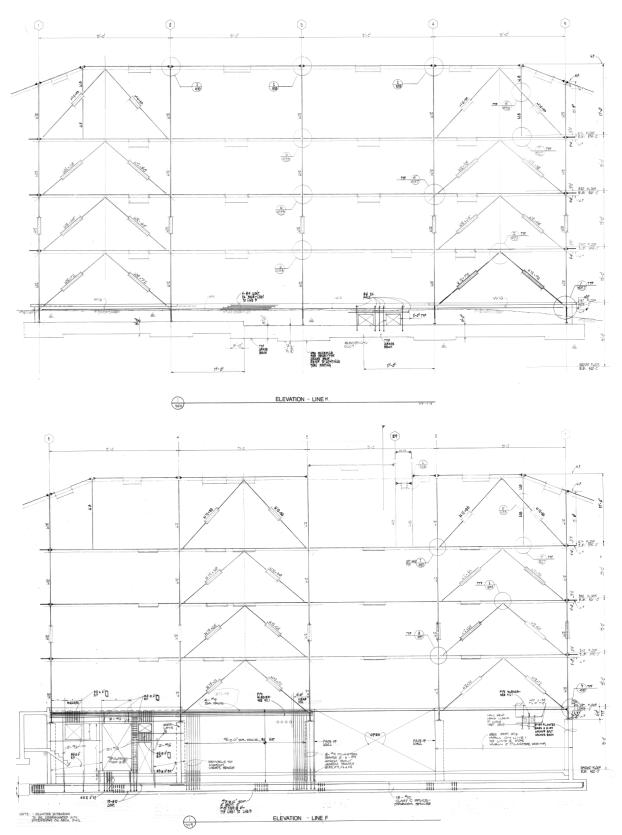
Longitudinal Frame Elevation (South Elevation)
